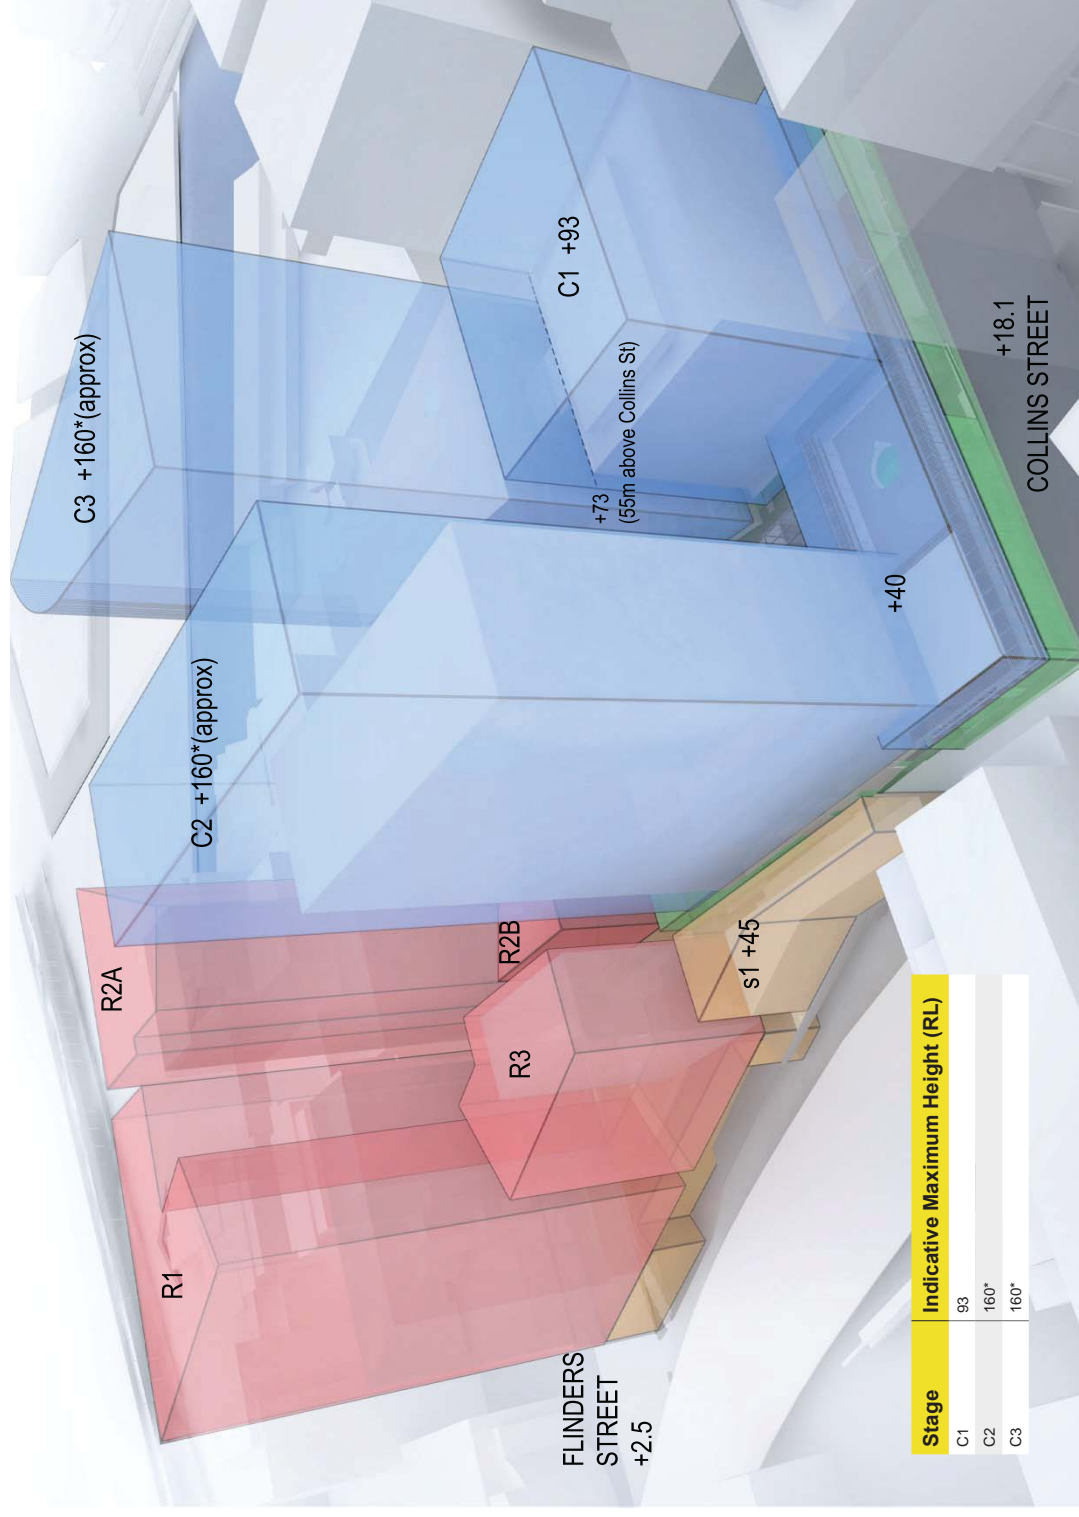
Maximum building envelopes, showing one possible building massing configuration within building envelopes
